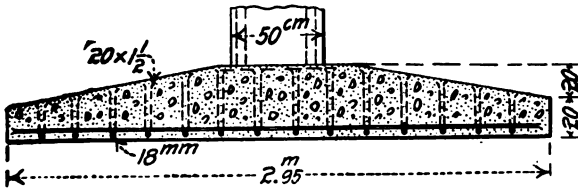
Column Footing with Bar and Stirrup Reinforcement (Hennebique).
